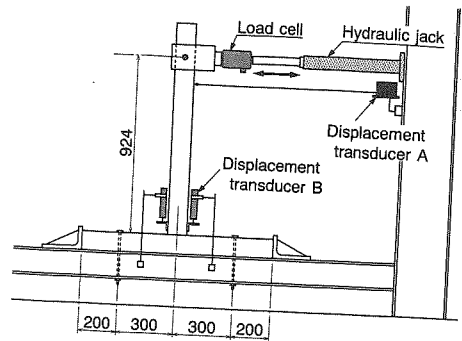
Geometry of joint specimens and setup of moment-applying tests (Unit: mm).
